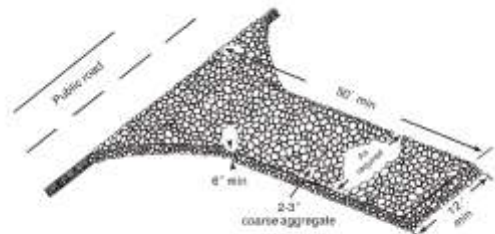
Gravel and washed stone barrier from leaving the construction site (modified from Va SWCC)
